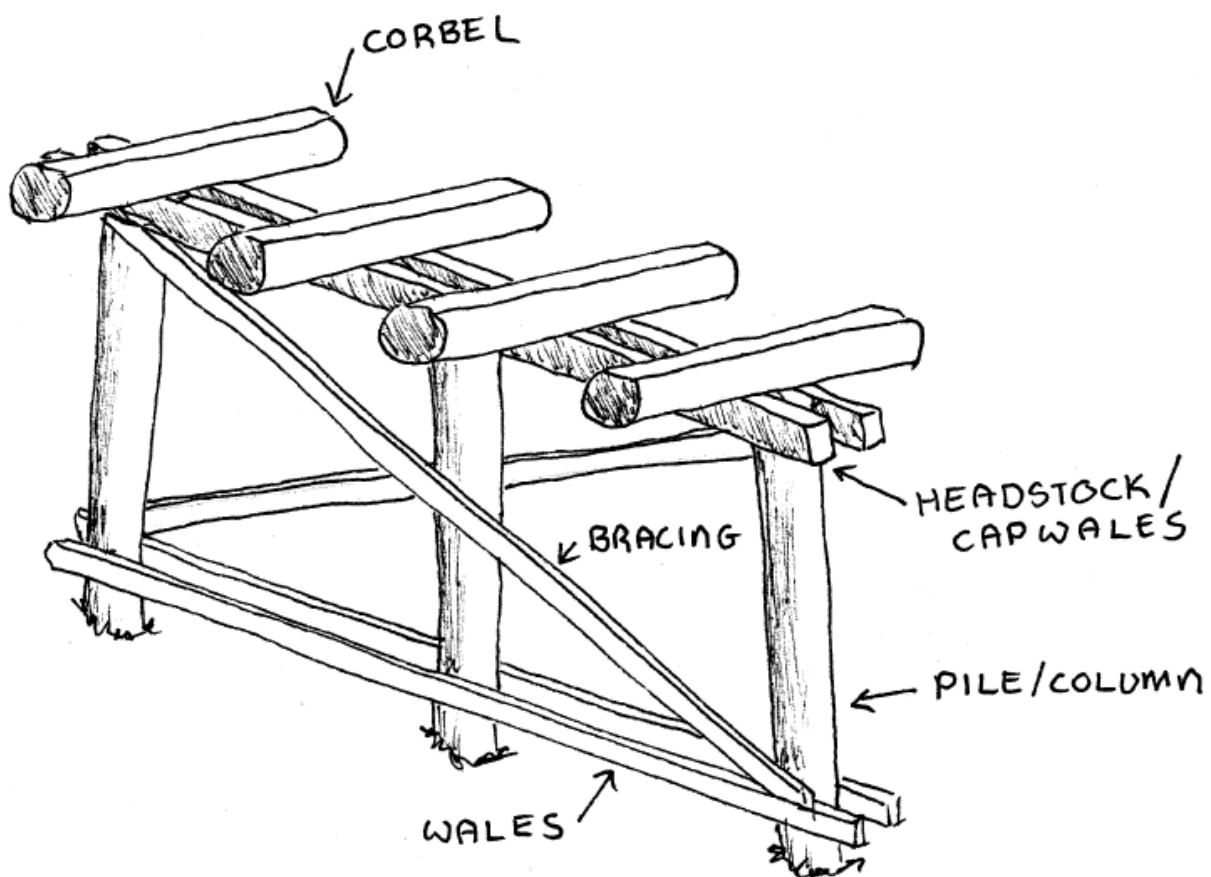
Sketch of Typical Elements of Timber Trestle Pier
